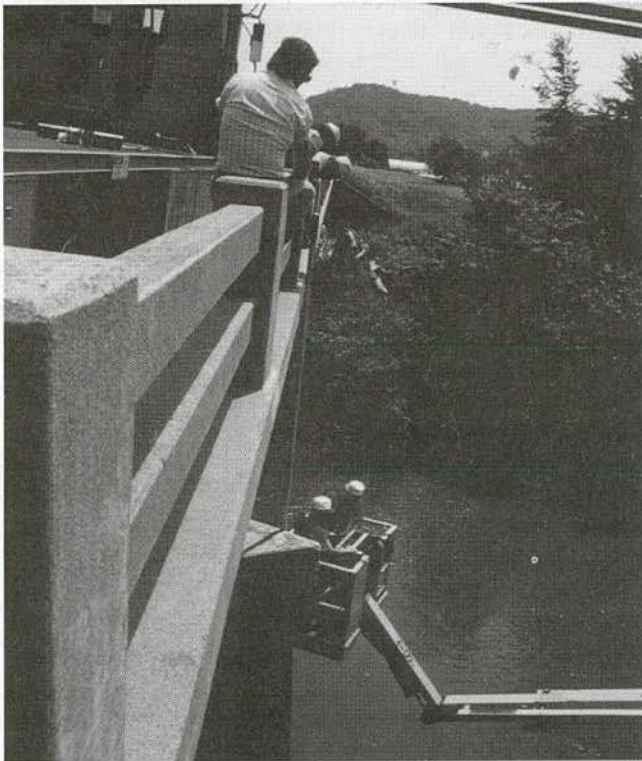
Installation of sliding collar device at Minnesota bridge no. 9003 (Site MN3).
